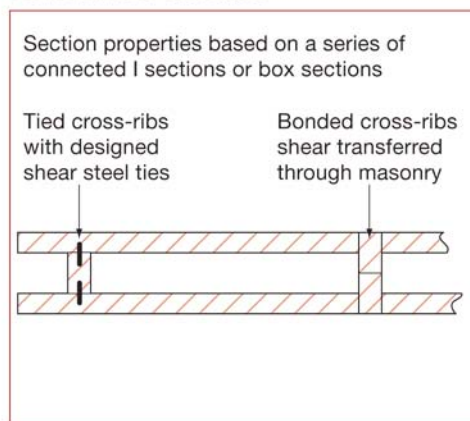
Typical diaphragm wall section Fig 5.26 Typical fin wall section
